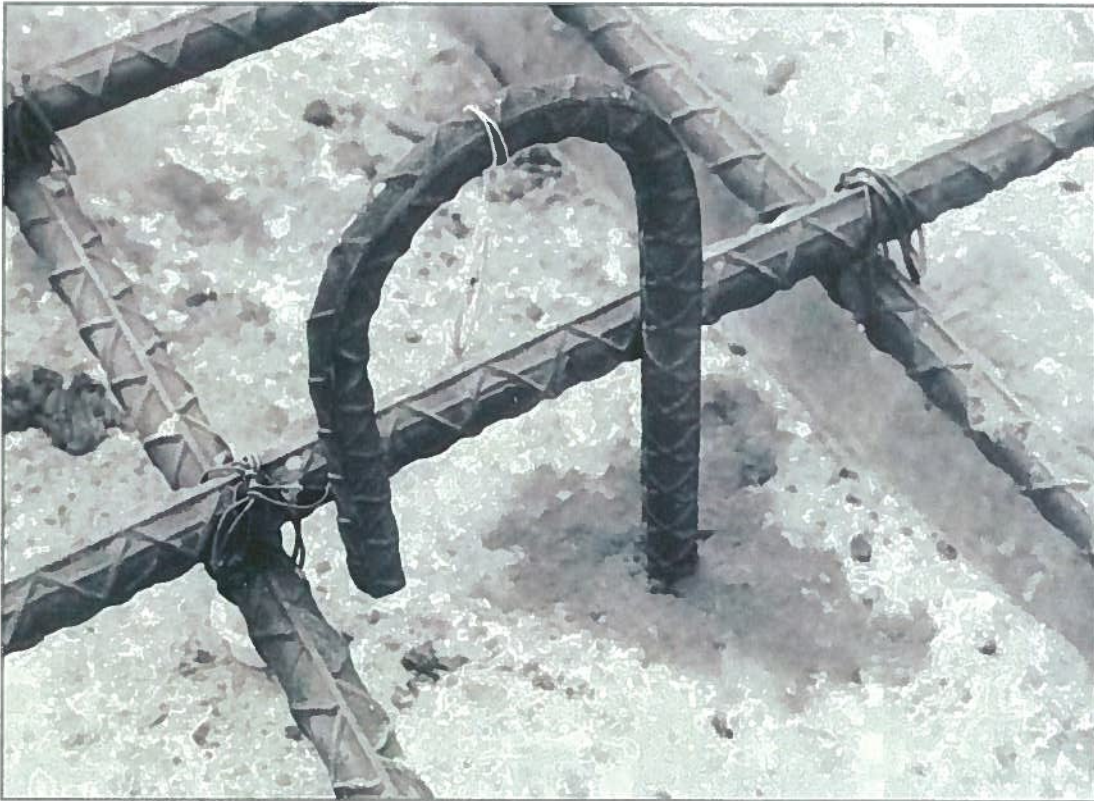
Photograph of a radial reinforcement installed as a corrective action to the CR3 Dome delamination
